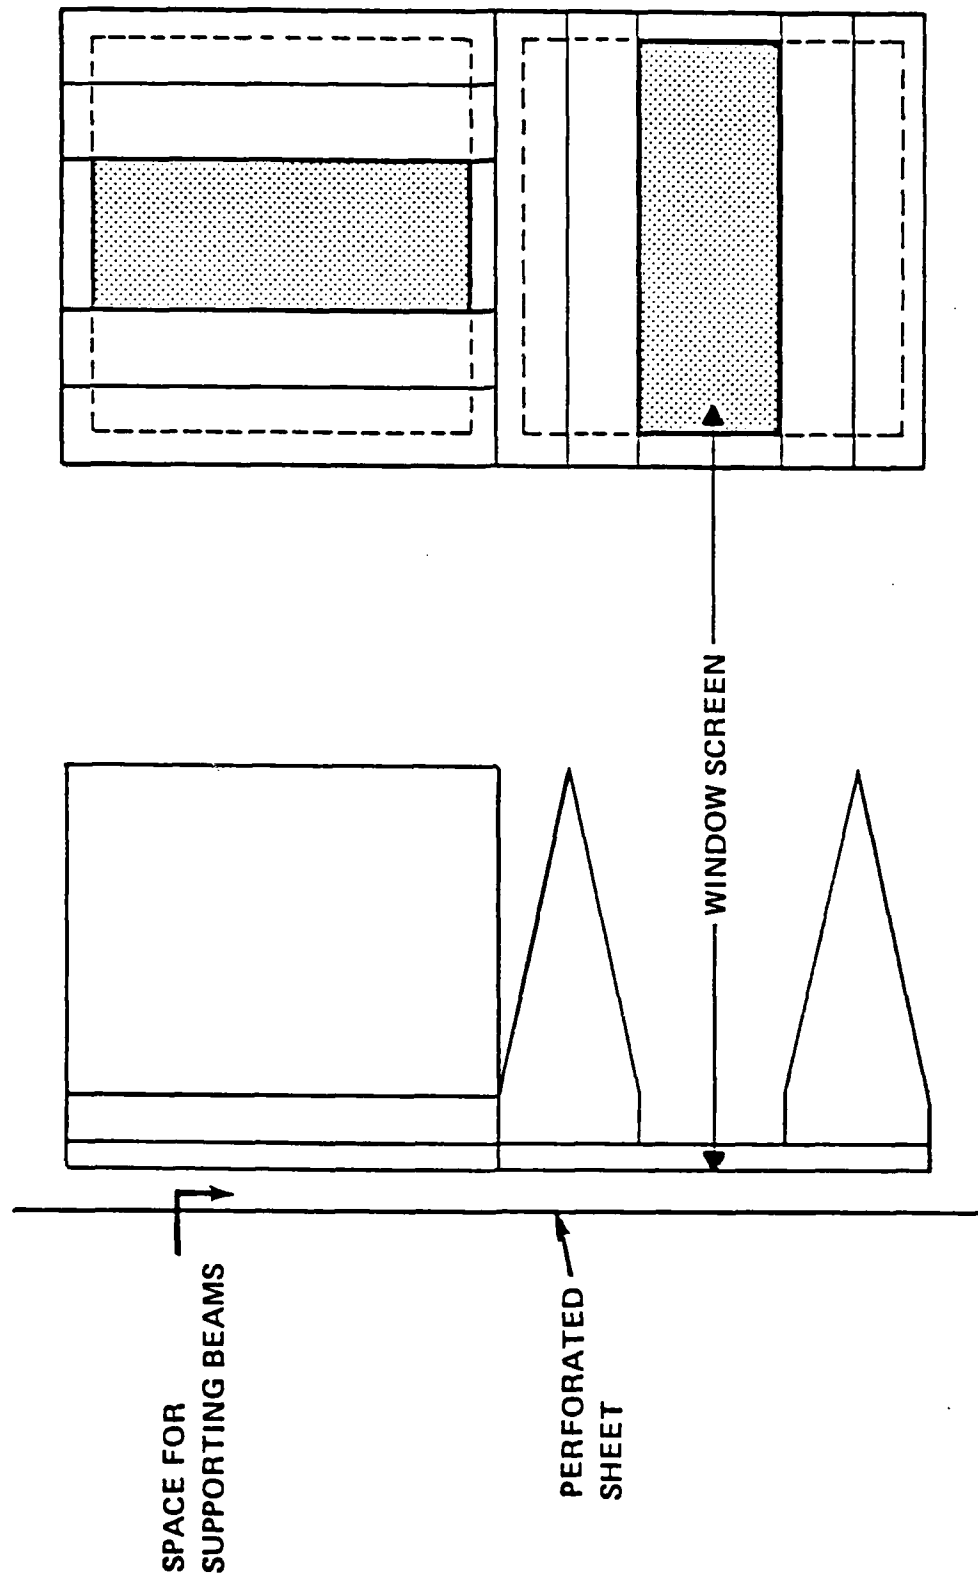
Two Adjacent Wedge Blocks showing Air Inlet Detail.
